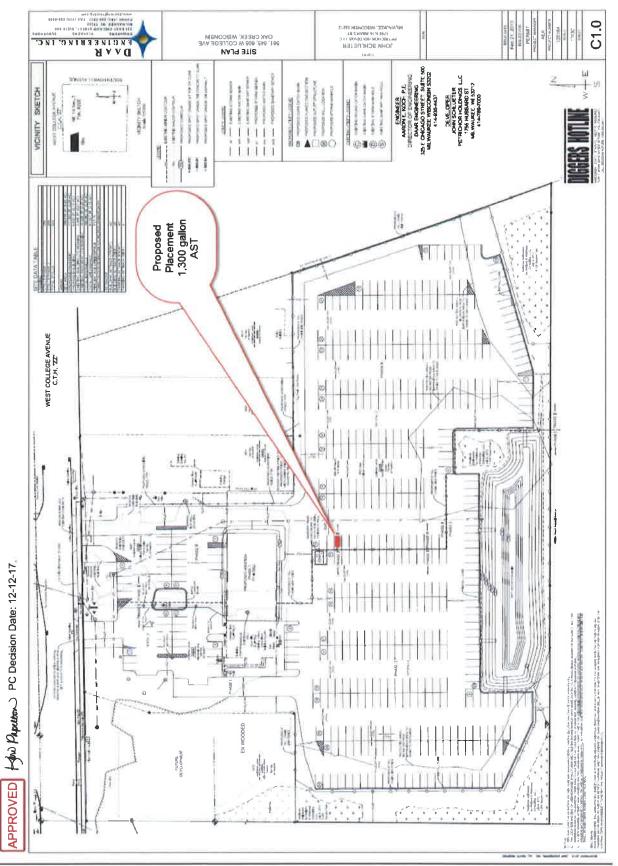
EXHIBIT B: SITE PLAN APPROVED 12-12-17 (FOR REFERENCE)
